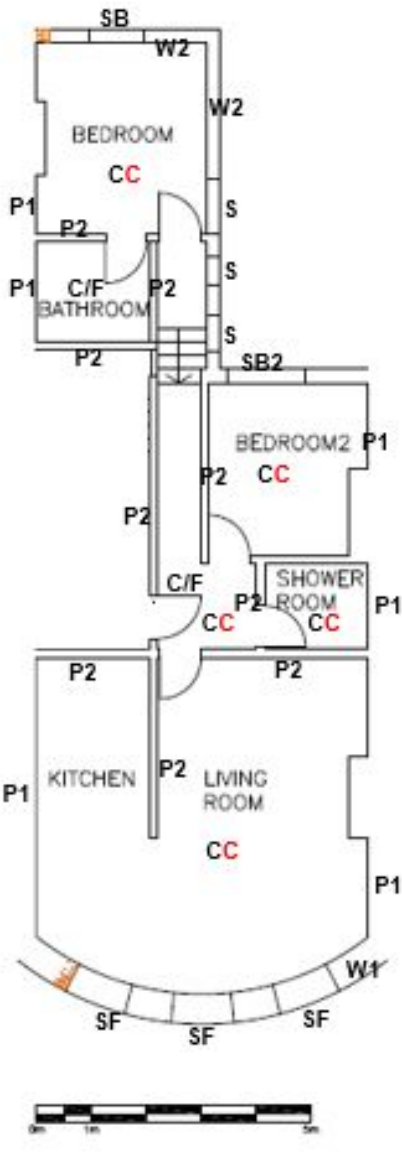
CS2: FLOOR PLAN WITH ANNOTATED REFERENCE ID FOR EACH CONSTRUCTION (IN BLACK: FLOORS; IN RED: CEILINGS/ROOFS)
